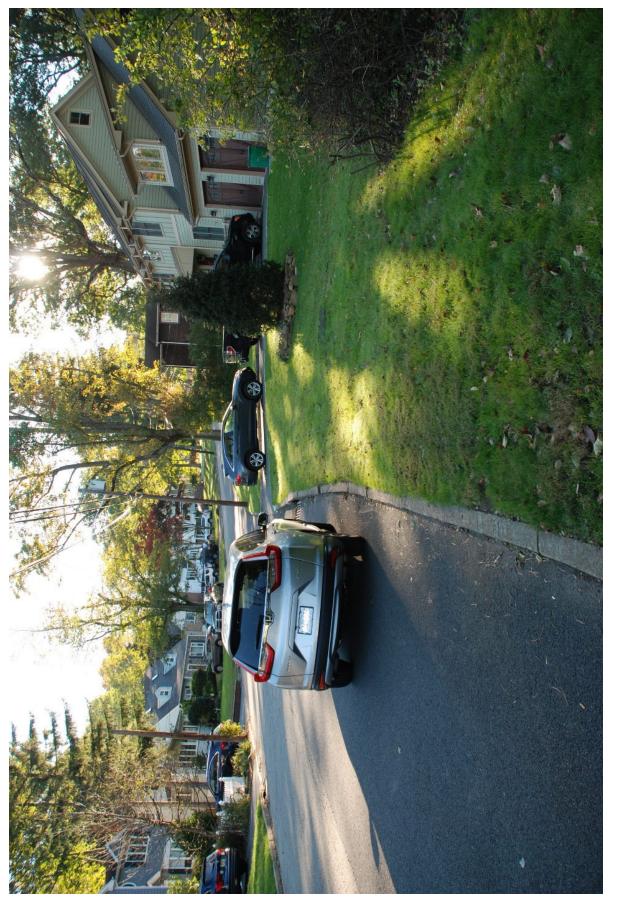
View looking East at an overview of Glenview Road and location where the culvert (described below) passes beneath Glenview Road.
